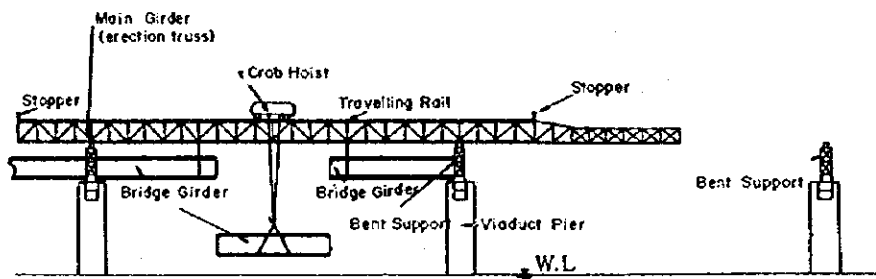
Inner Ring Expressway – Erection Girder
